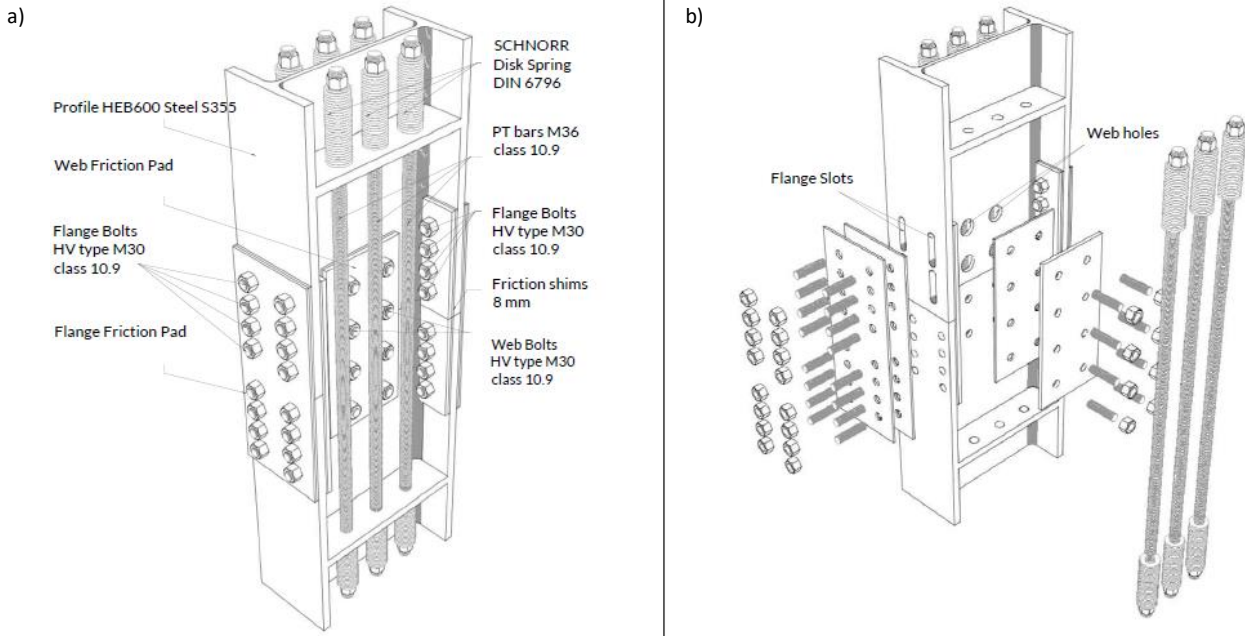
Details of the proposed column base connection: (a) 3D view; (b) Exploded 3D view.
